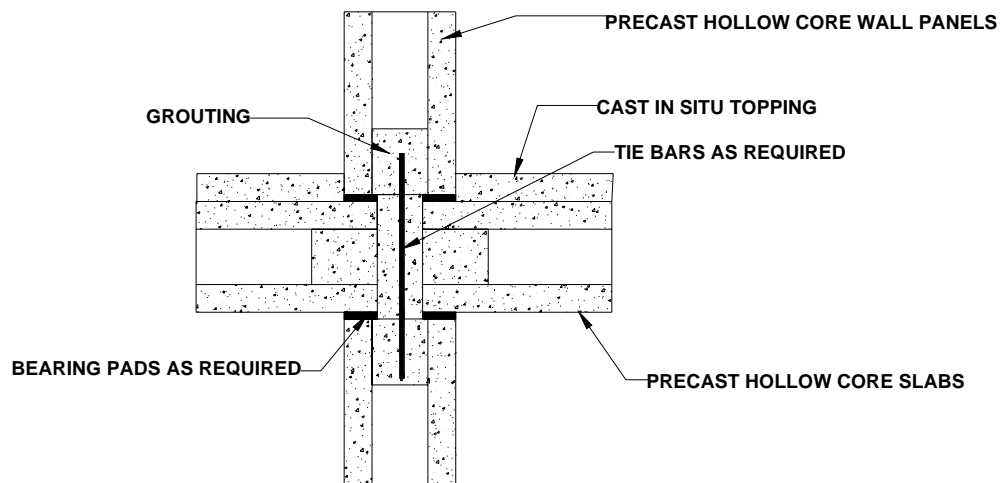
Connection between precast hollow core slabs and internal precast hollow core walls (Precast Technology, 1991).
